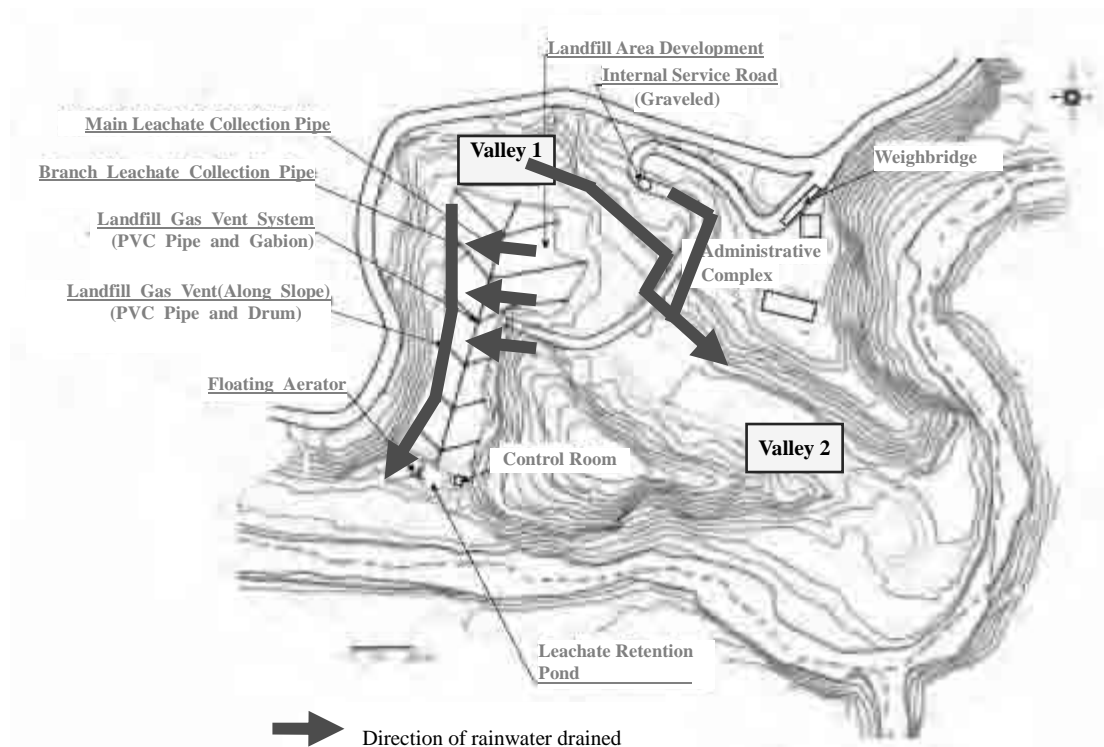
Proposed Plan for Rainwater Drainage
